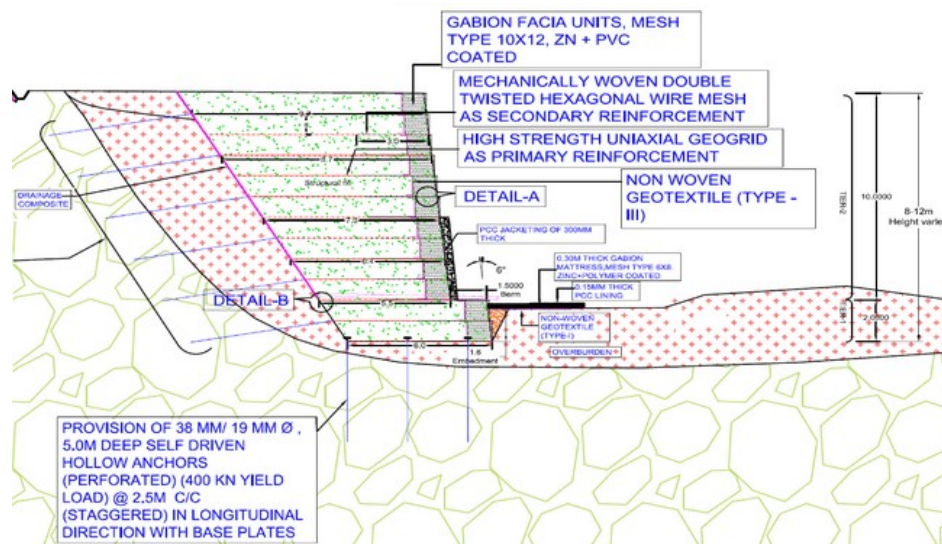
Typical section of Reinforced Soil Wall with gabion facia designed at one of project
